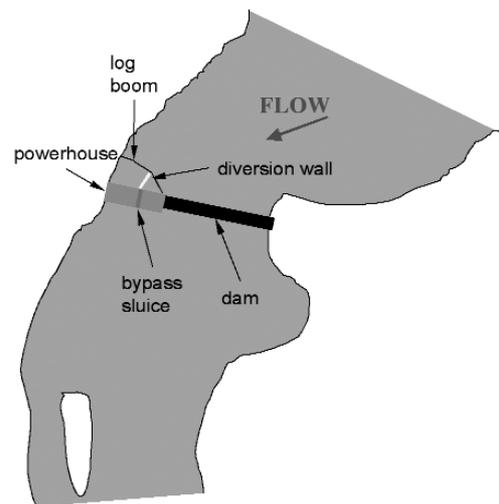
Site plan, Vernon Dam, Connecticut River, Vermont, USA.
